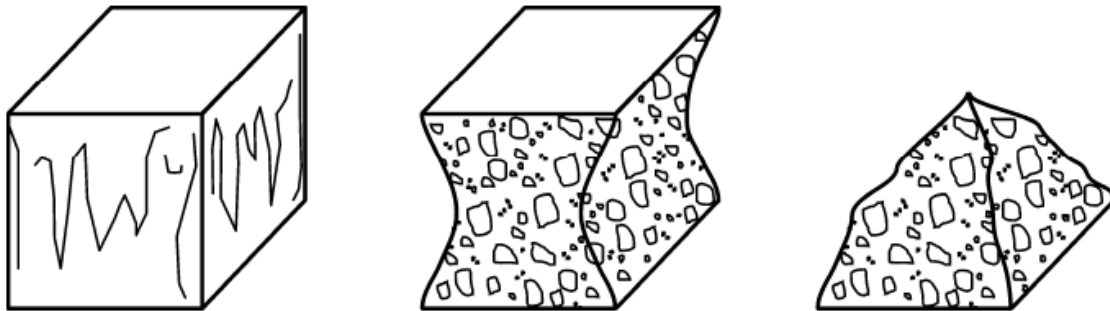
Failures of a cubic test specimen (Standard Norge, 2009)
